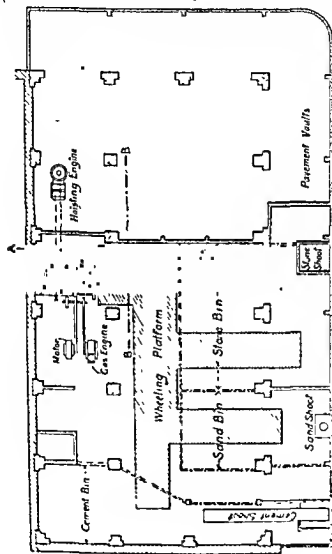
Plan of Basement, showing Concrete Plant and Storage Bins
